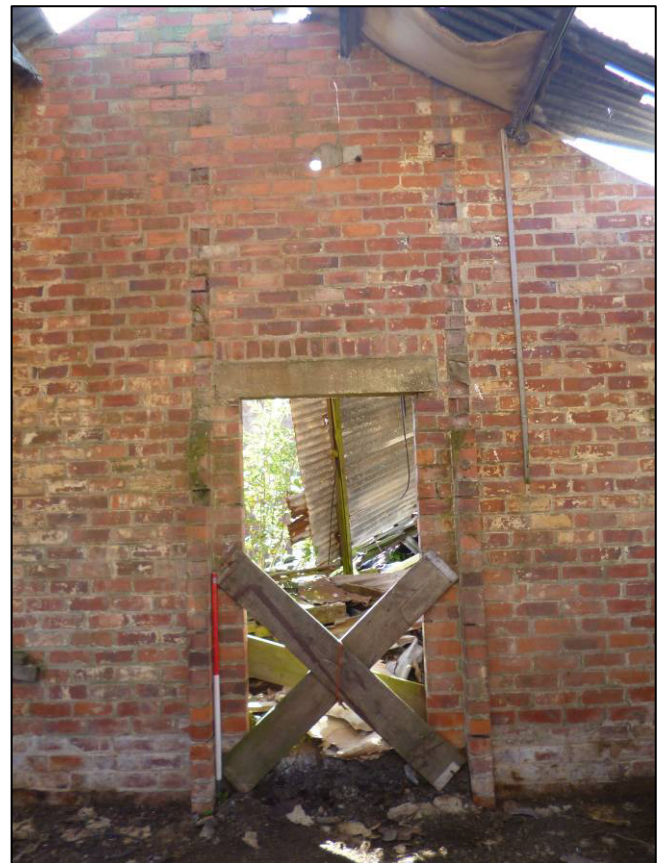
Structure A3 (cookhouse), internal south wall of north cell, looking S (photo 1/635).
